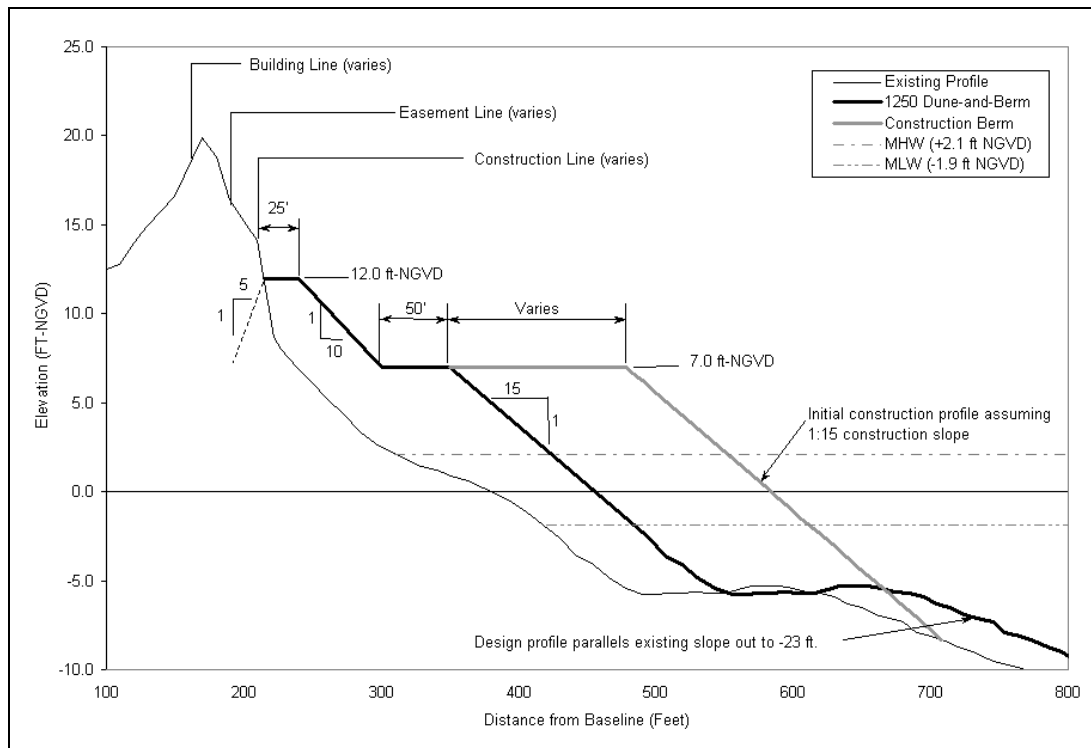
Typical 1250X Beachfill Profile - Selected Plan
